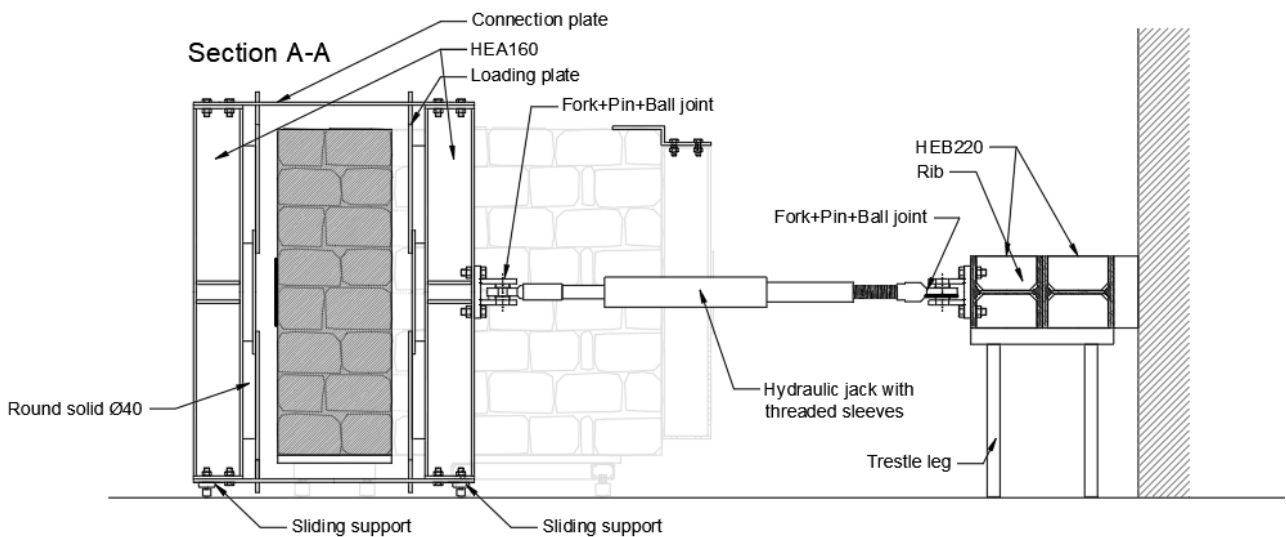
Out of plane bending of "C" walls tests setup, section view.
